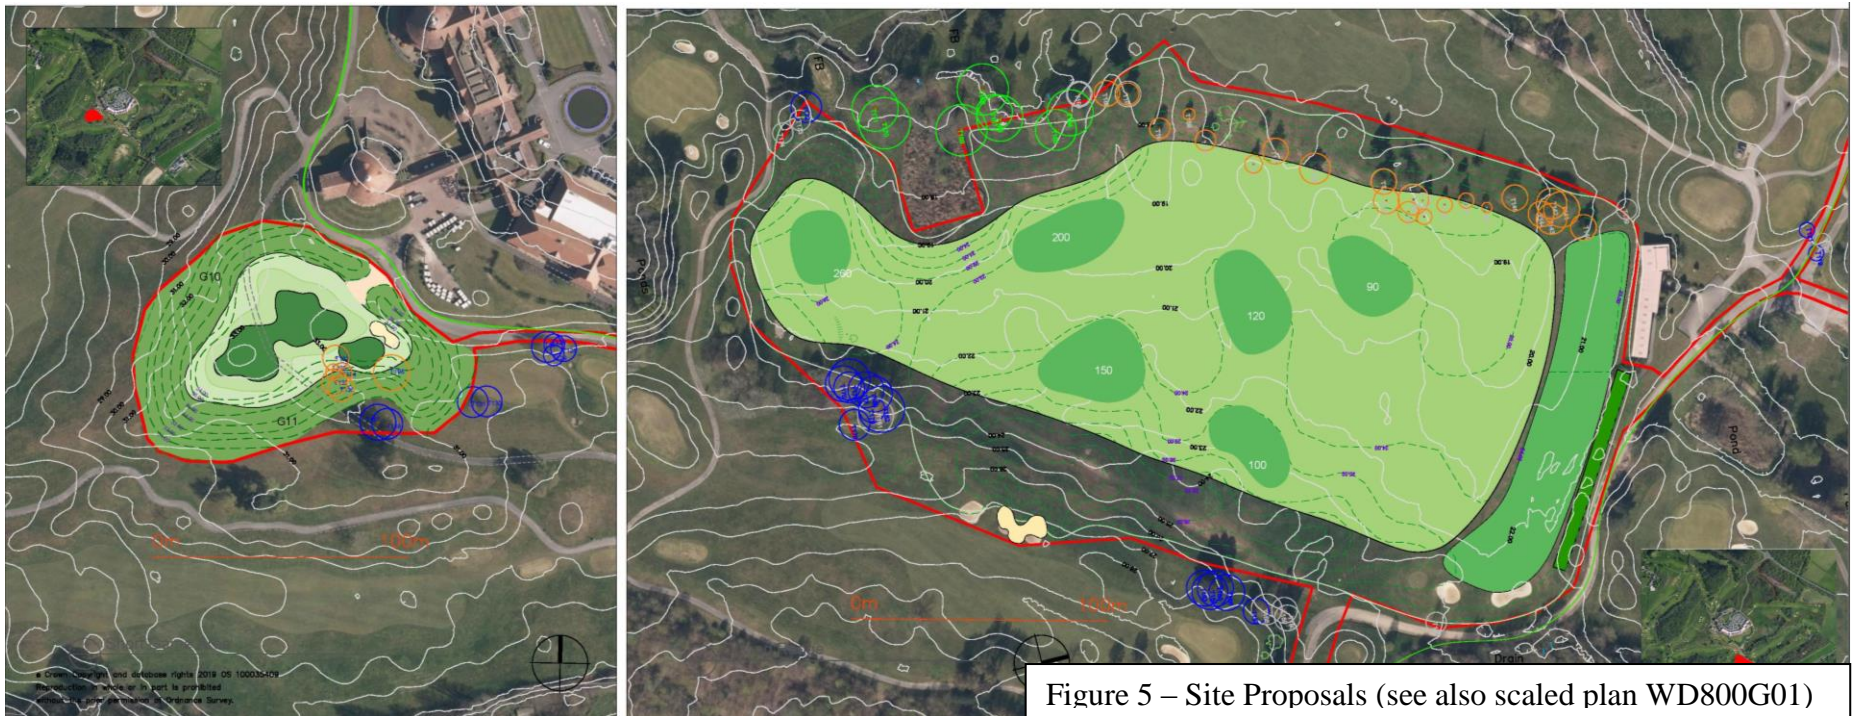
Site Proposals (see also scaled plan WD800G01)
